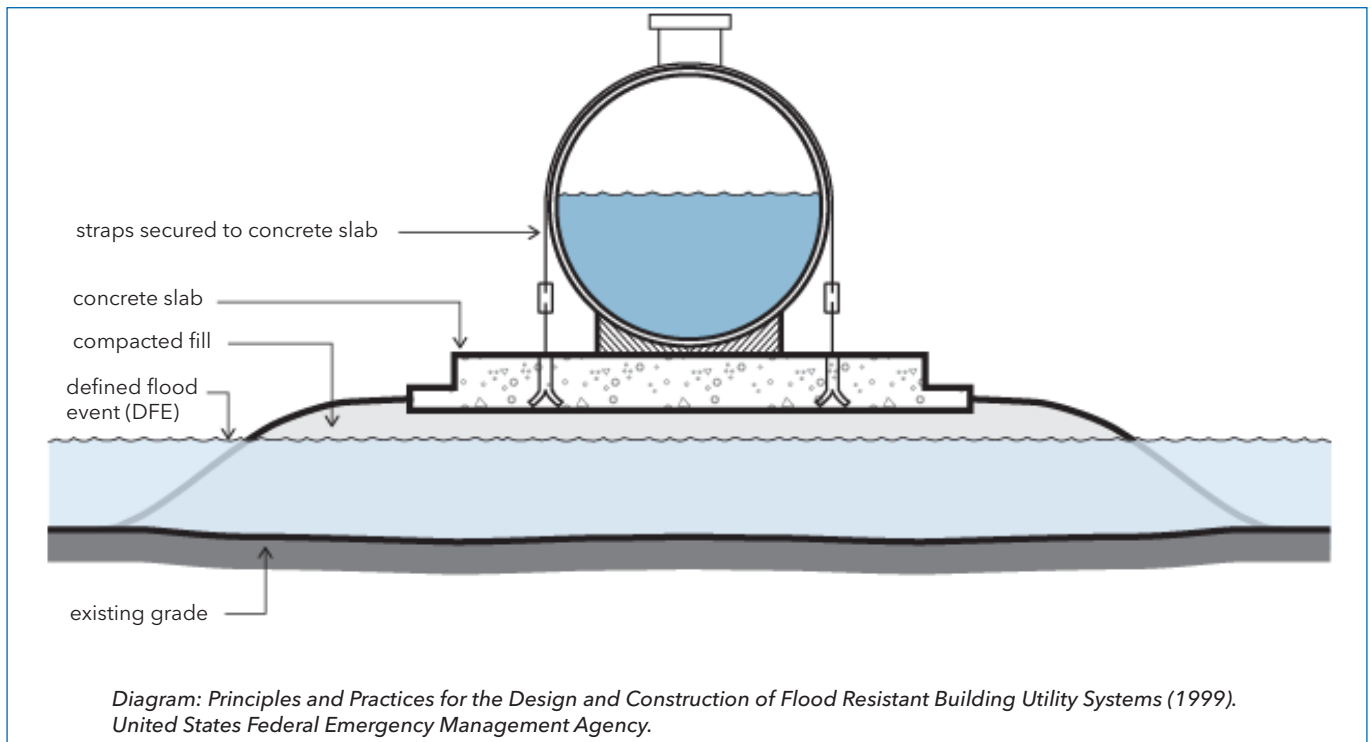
Securing an aboveground tank to a concrete slab or counterweight
